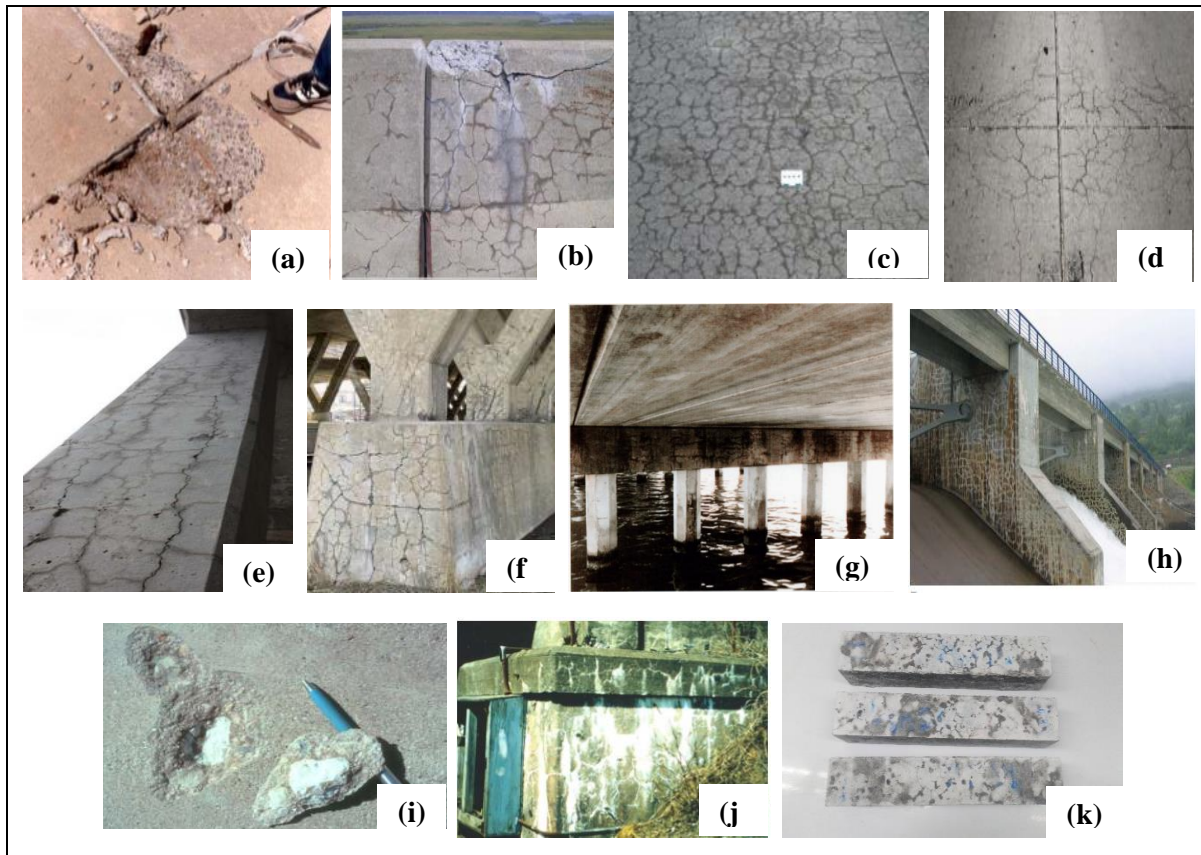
(a) Concrete spalling joint induced by ASR; (b) Parapet wall of bridges movement; (c) A well-developed cracks associated with ASR; (d) D-cracking associated with ASR; (e) Longitudinal cracking related to ASR in column bridges; (f) Verticals cracks shown in parapet walls; (g) Horizontal Cracking on pier cap of bridge; (h) Map cracking in bridge wing walls cause by ASR; (i) Pop outs distress; (j) Surface discoloration and exudation; (k) Expansion & Cracks seen in testing
